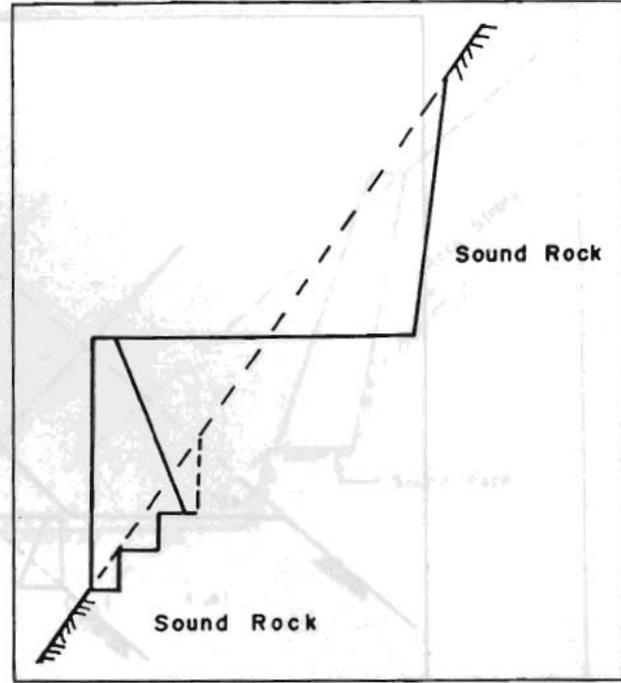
A Cement masonry wall can be constructed economically in rocky areas because benching of the foundation is possible and the backfill wedge may also be smaller.
